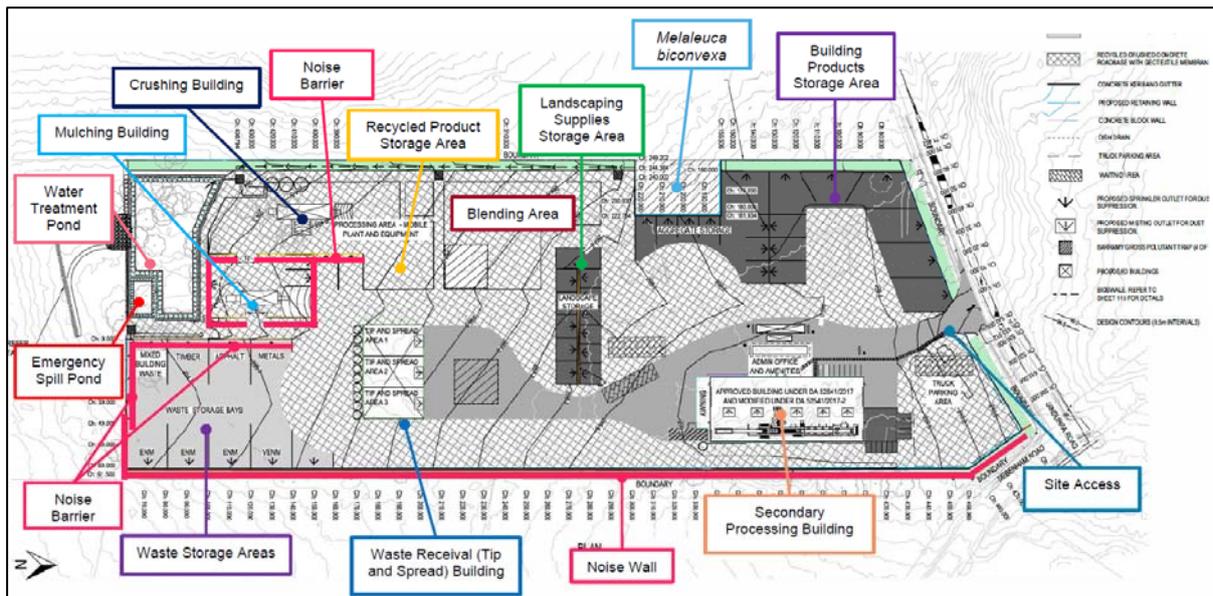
Proposed Site Plan (development footprint) (Source: Department's AR)
